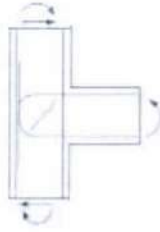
Forces acting at joint (Satisfactory Reinforcement)
